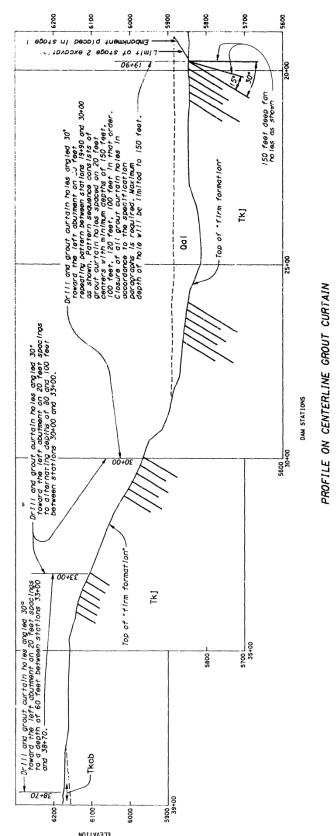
Section view of original grout curtain design at Jordanelle Dam – Stage 2 (2 of 2)
